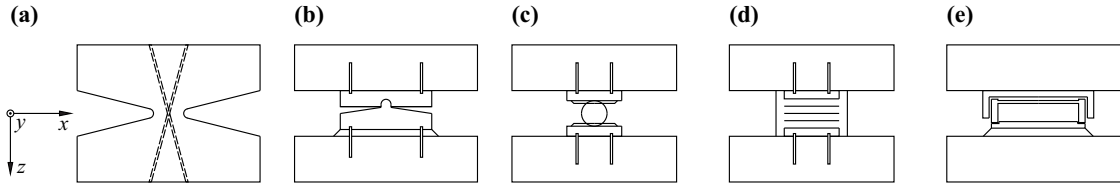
Types of bearing: (a) concrete hinge, (b) steel linear rocker bearing, (c) steel roller bearing, (d) laminated elastomeric bearing, (e) elastomer pot sliding bearing
